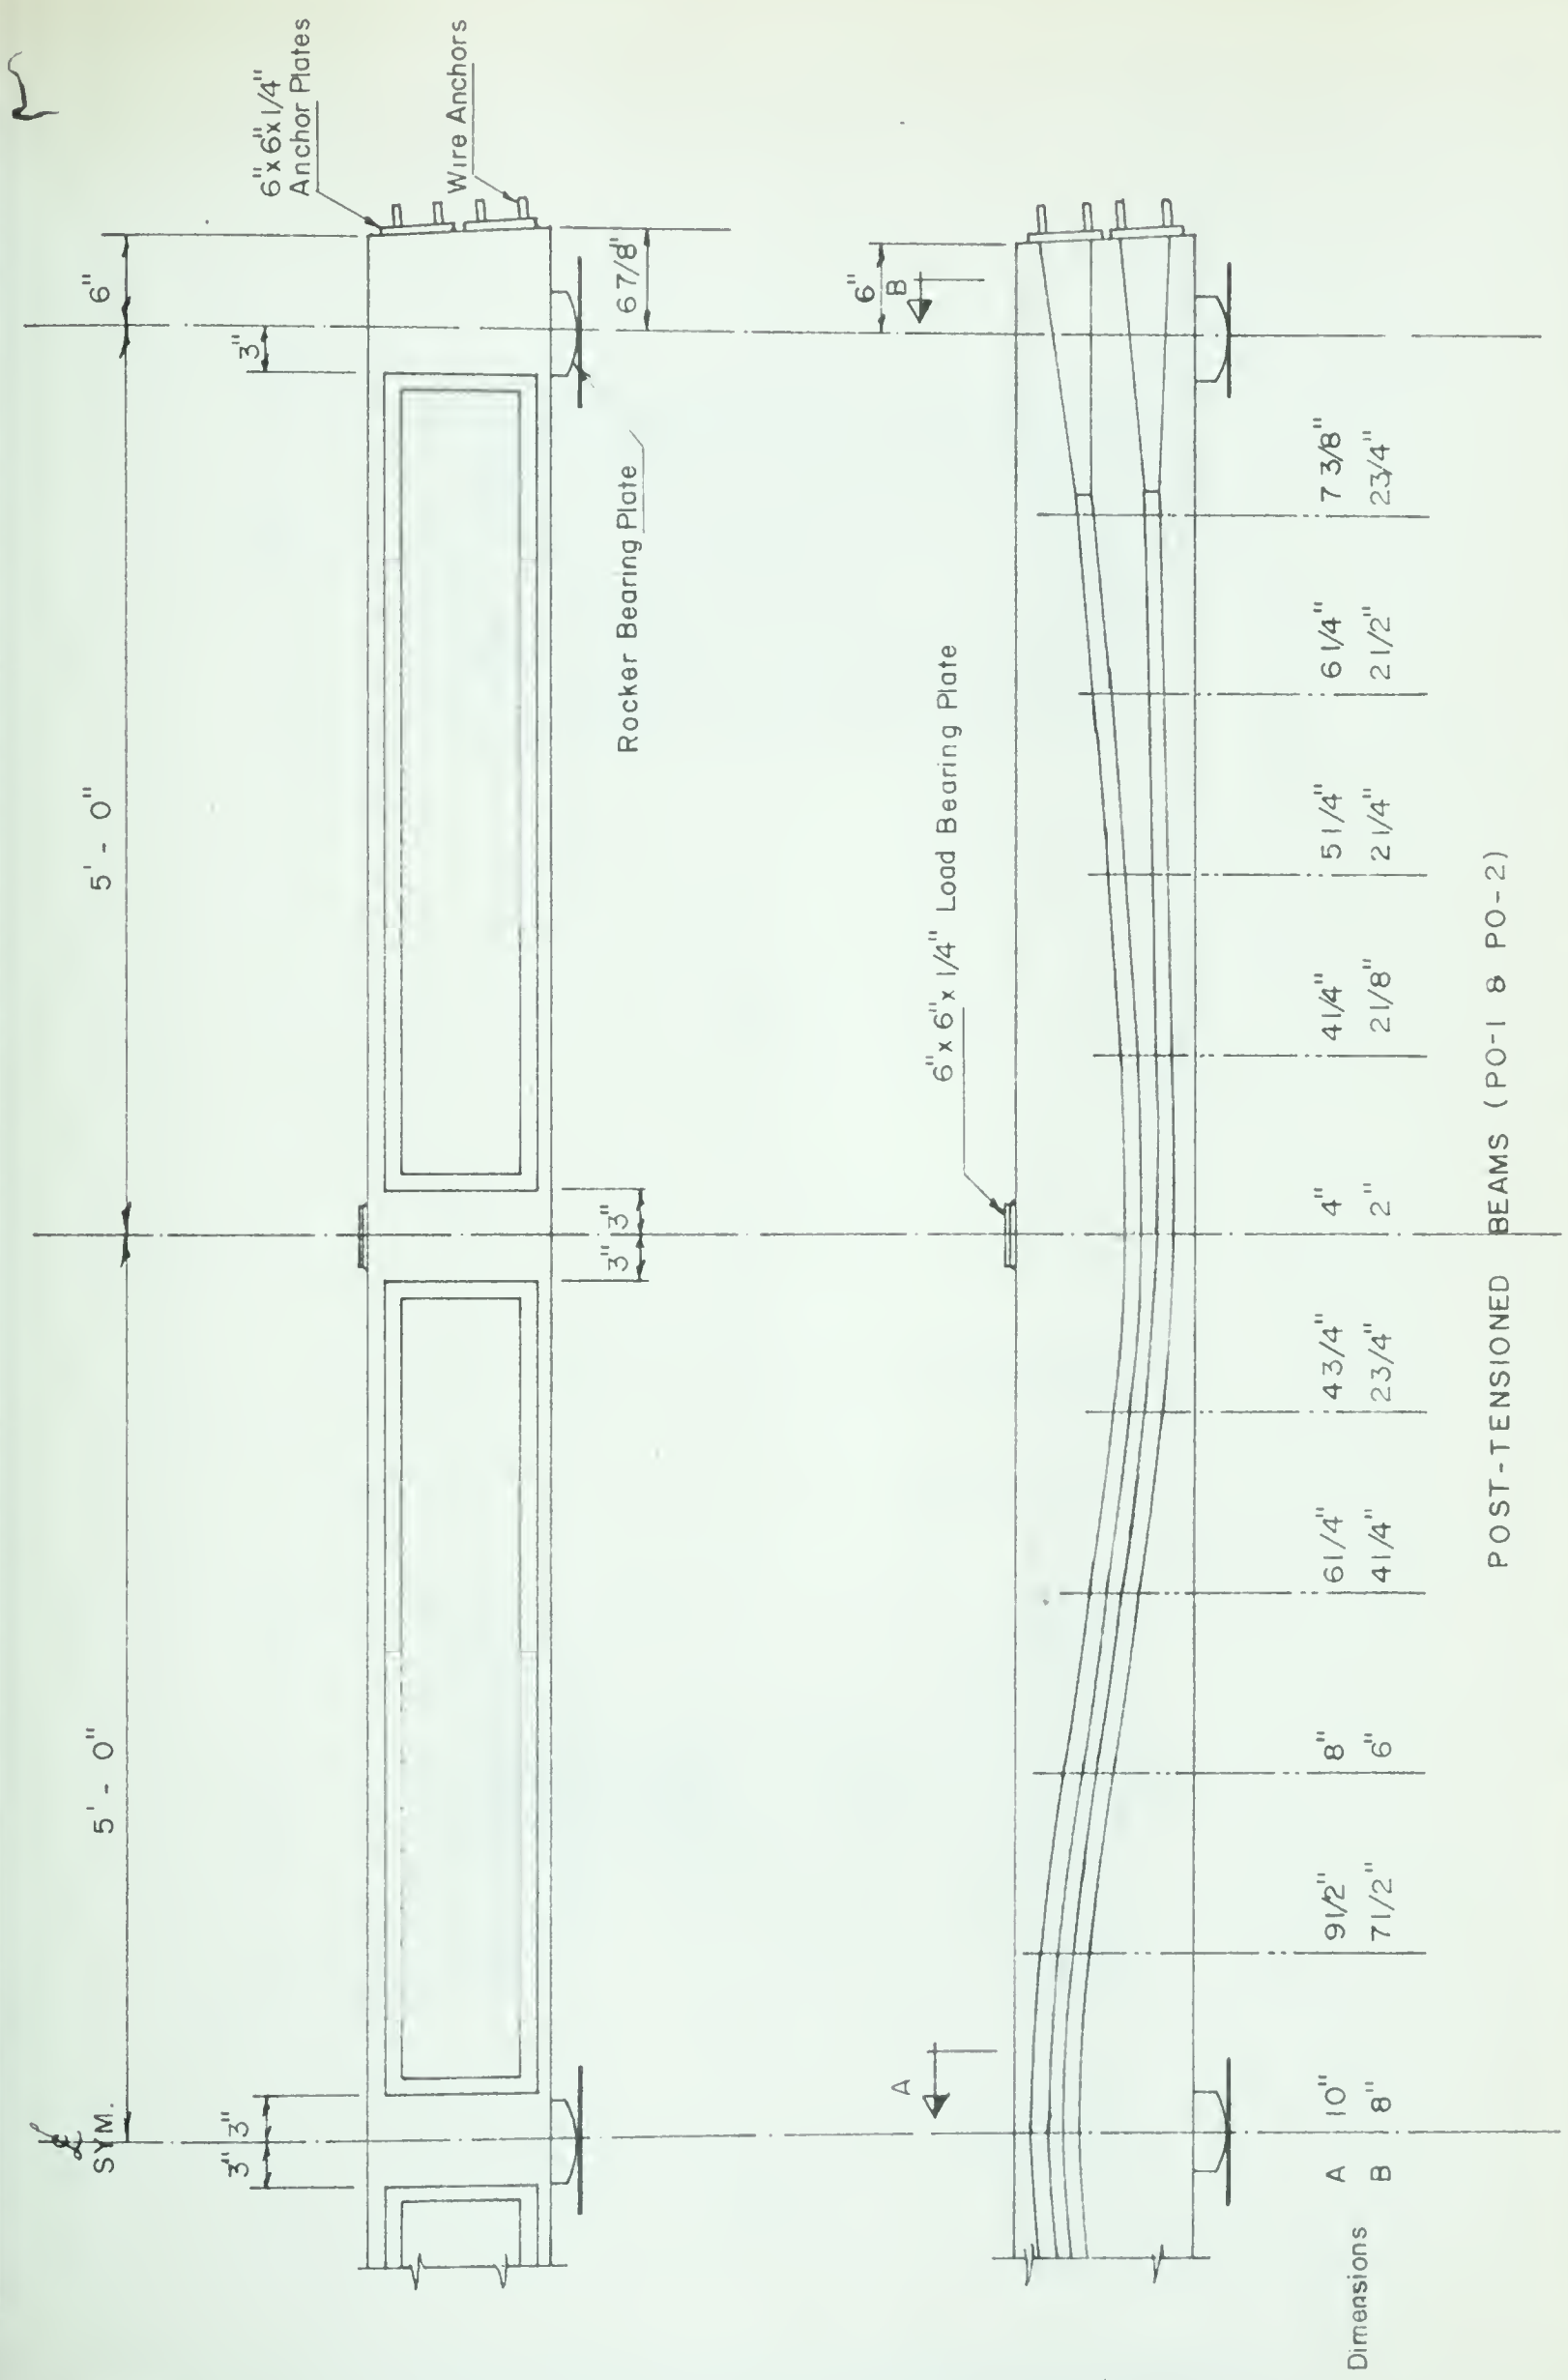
(a) DETAILS OF POST-TENSIONED BEAMS
